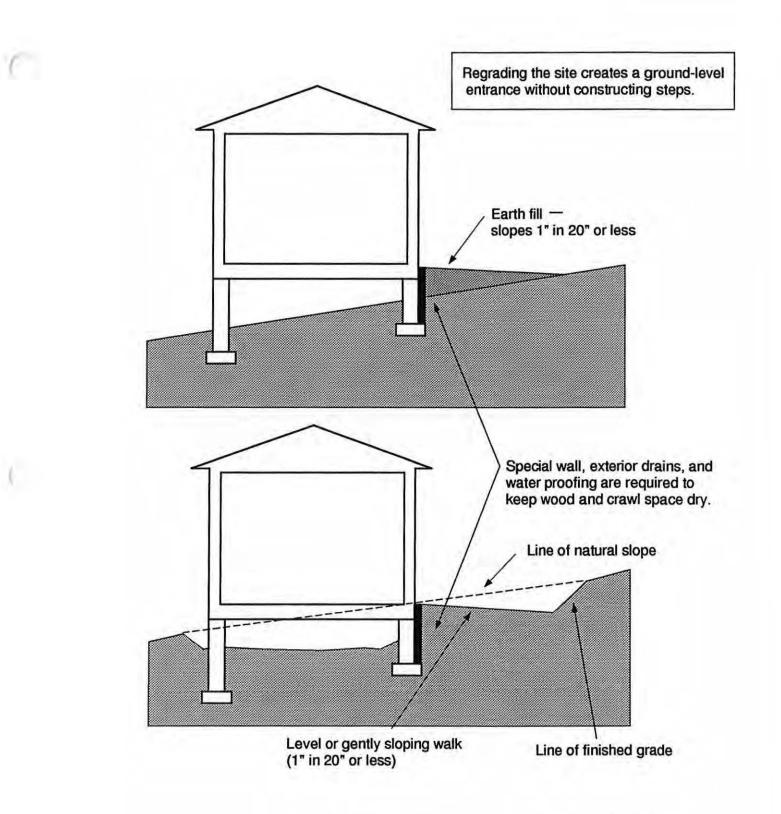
Earth fill or earth cut grading at house entrance for sloping site.* * Adapted from Accessible Housing Design File.
